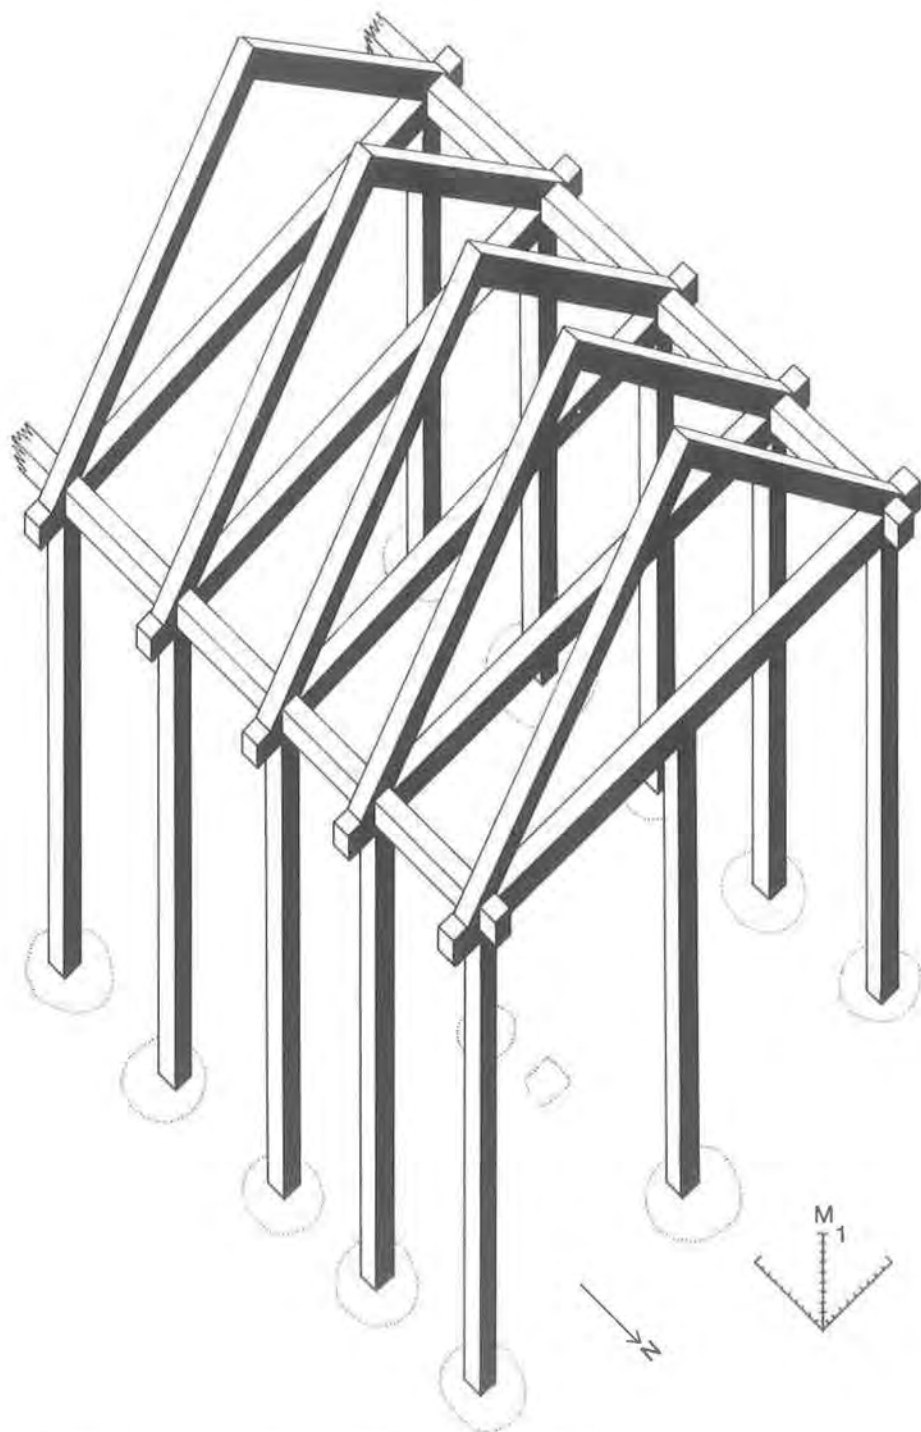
Reconstruction drawing of Building 60; Site 17, Area 1.
